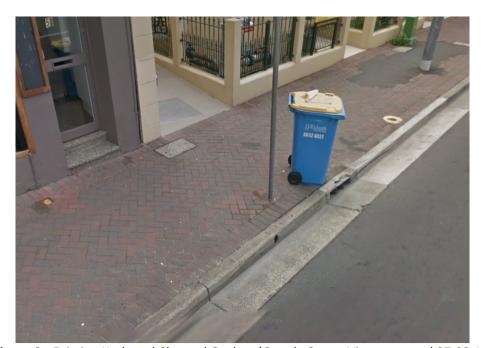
Existing Kerb and Channel Outlets (Google Street View accessed 27.08.19)
